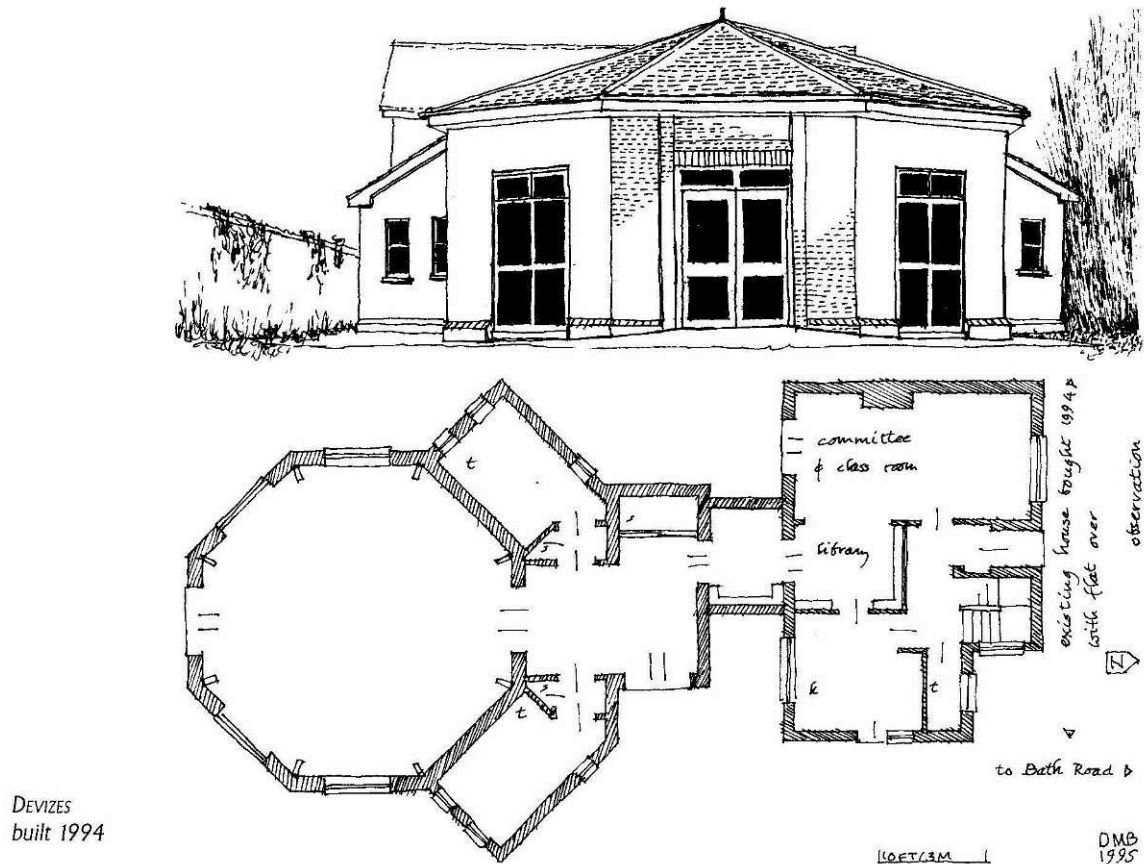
Ground plan and perspective view of east front towards the canal (Butler, vol. 2, p. 681)
